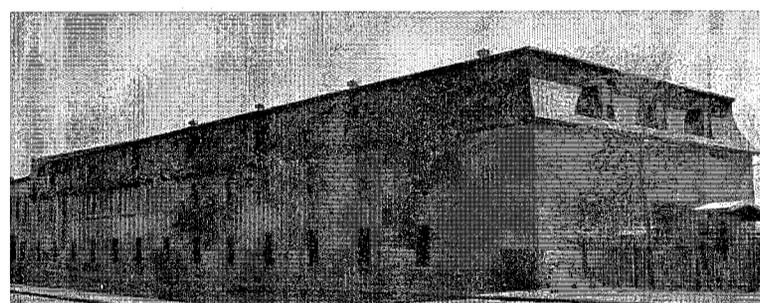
Building #6 (3 stories), with mansard roof and dormers
